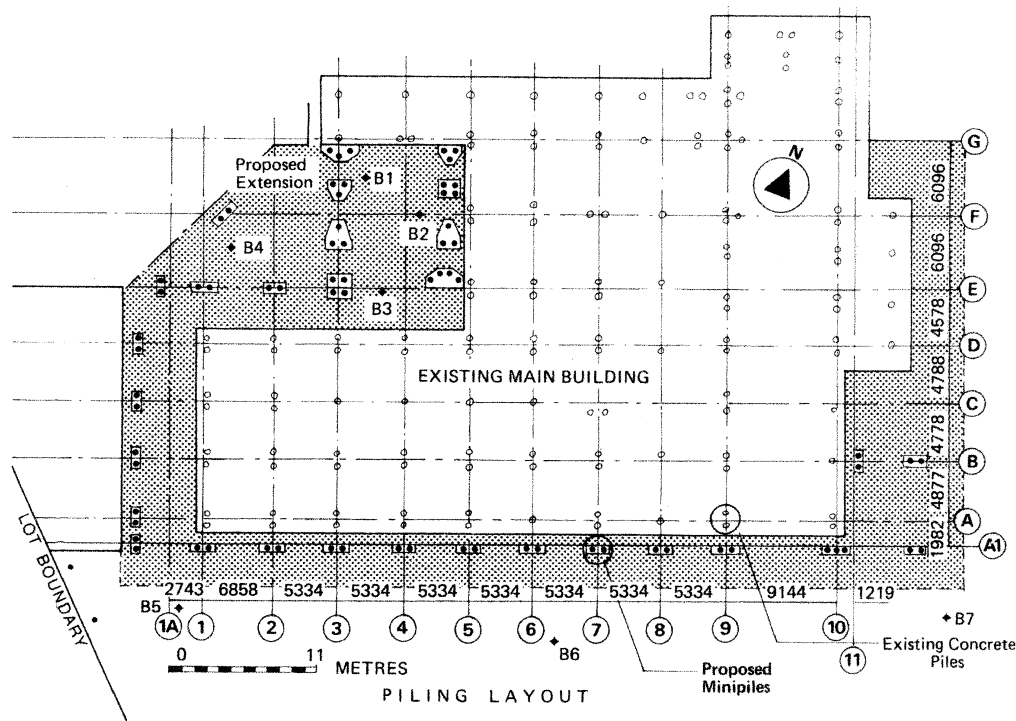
Plan of Hong Kong Country Club showing proposed extension and minipile locations
